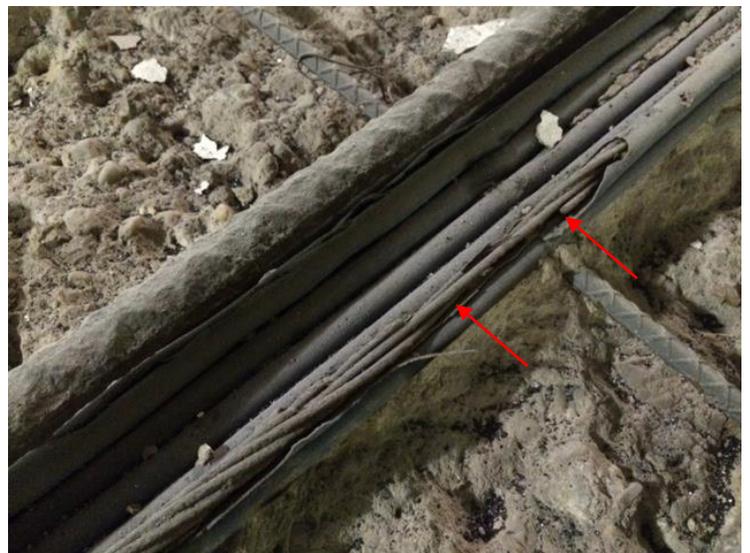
Damaged sheathing around a PT tendon on a garage slab. Most of the individual strands from this 7-wire stand have corroded and severed.
